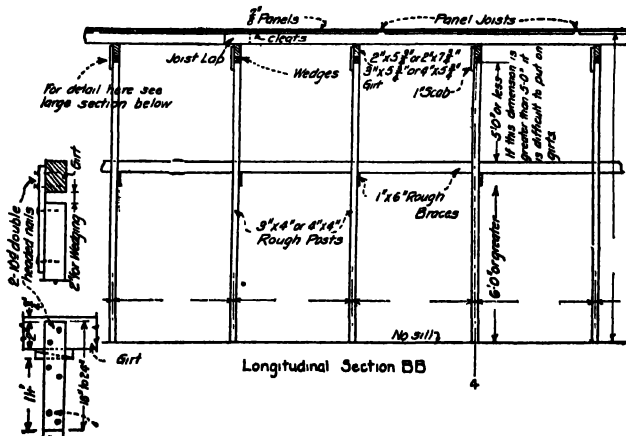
Assembly plan for interior bay—flat slab floor.
